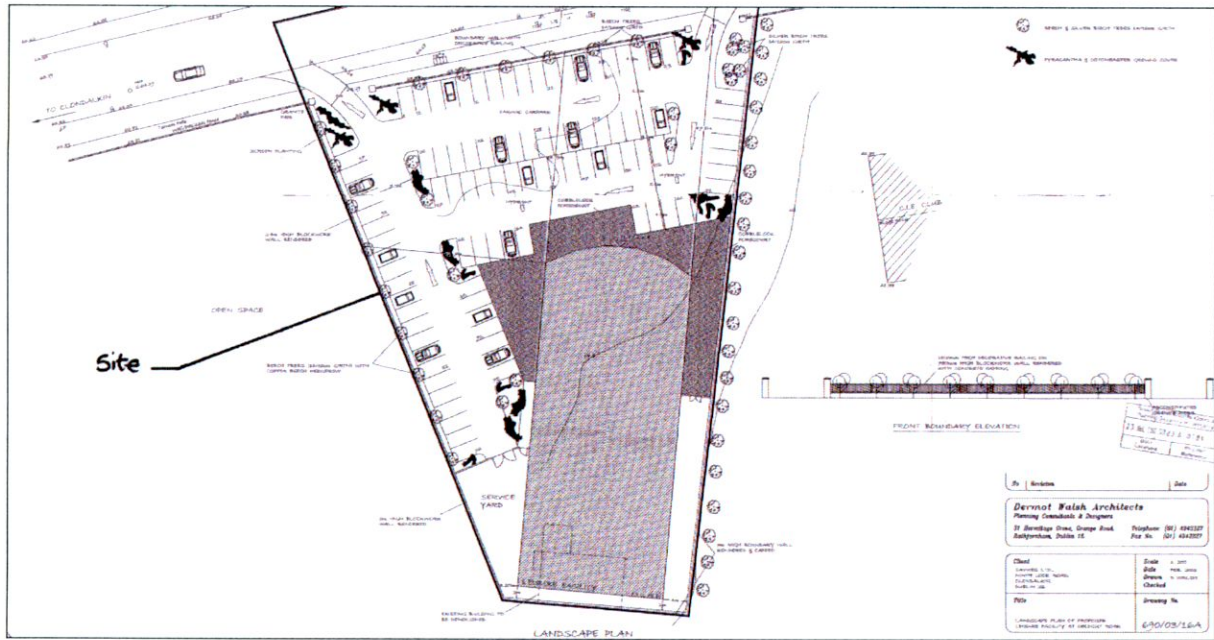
Landscape plan proposed under Reg. Ref. SD03A/0184. Site shows 97 no. car parking spaces provided.
